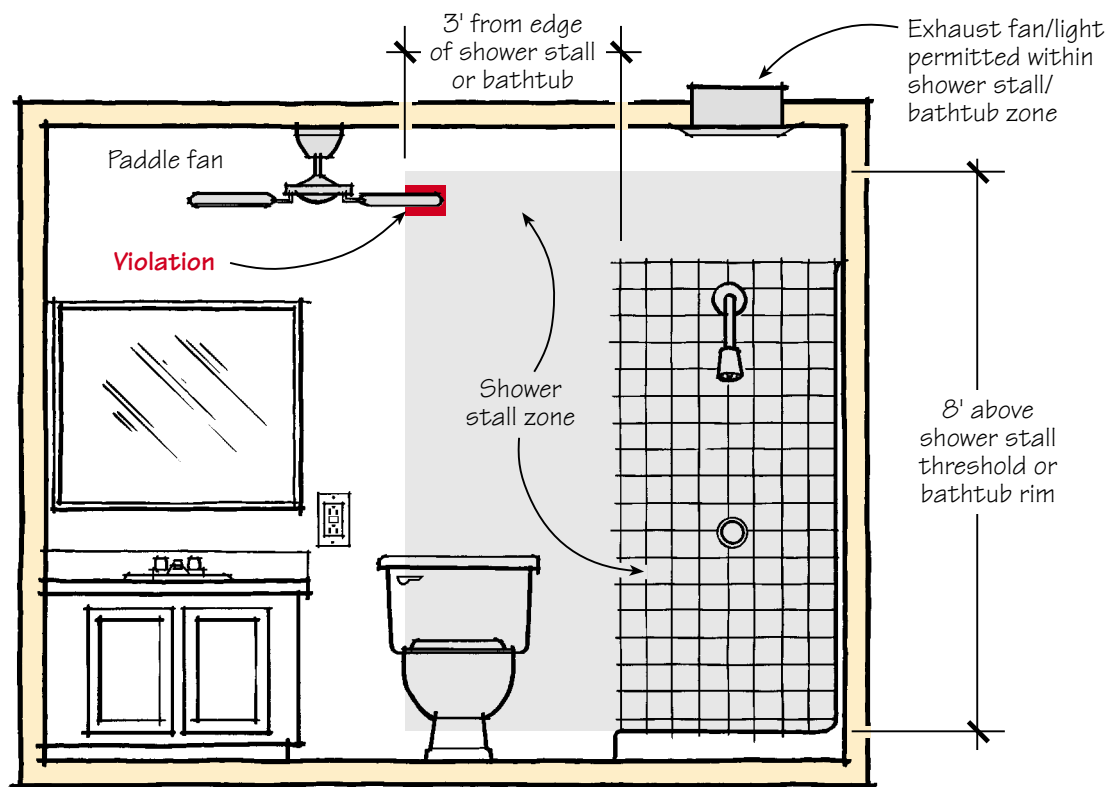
An exhaust fan can be installed in a 3x8-foot zone above a bathtub or shower, but a paddle fan cannot.
